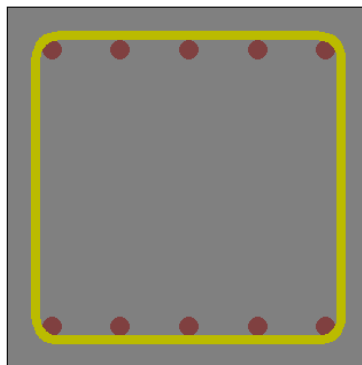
Cross section with reinforcement determined in [2] (10 No.9).
